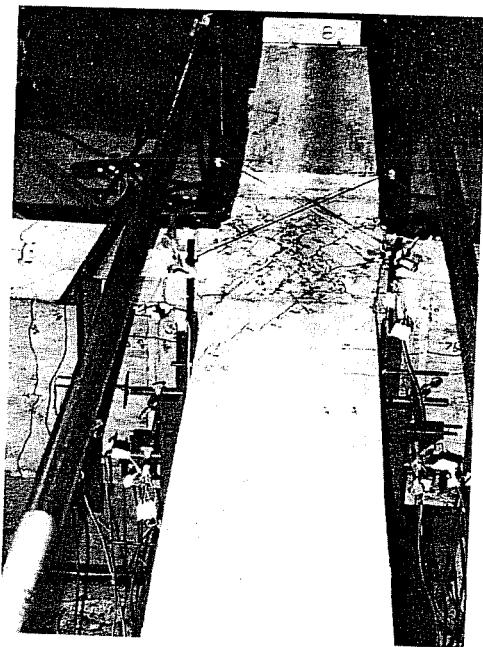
Column distortion due to shear in the joint (Specimen IV)
